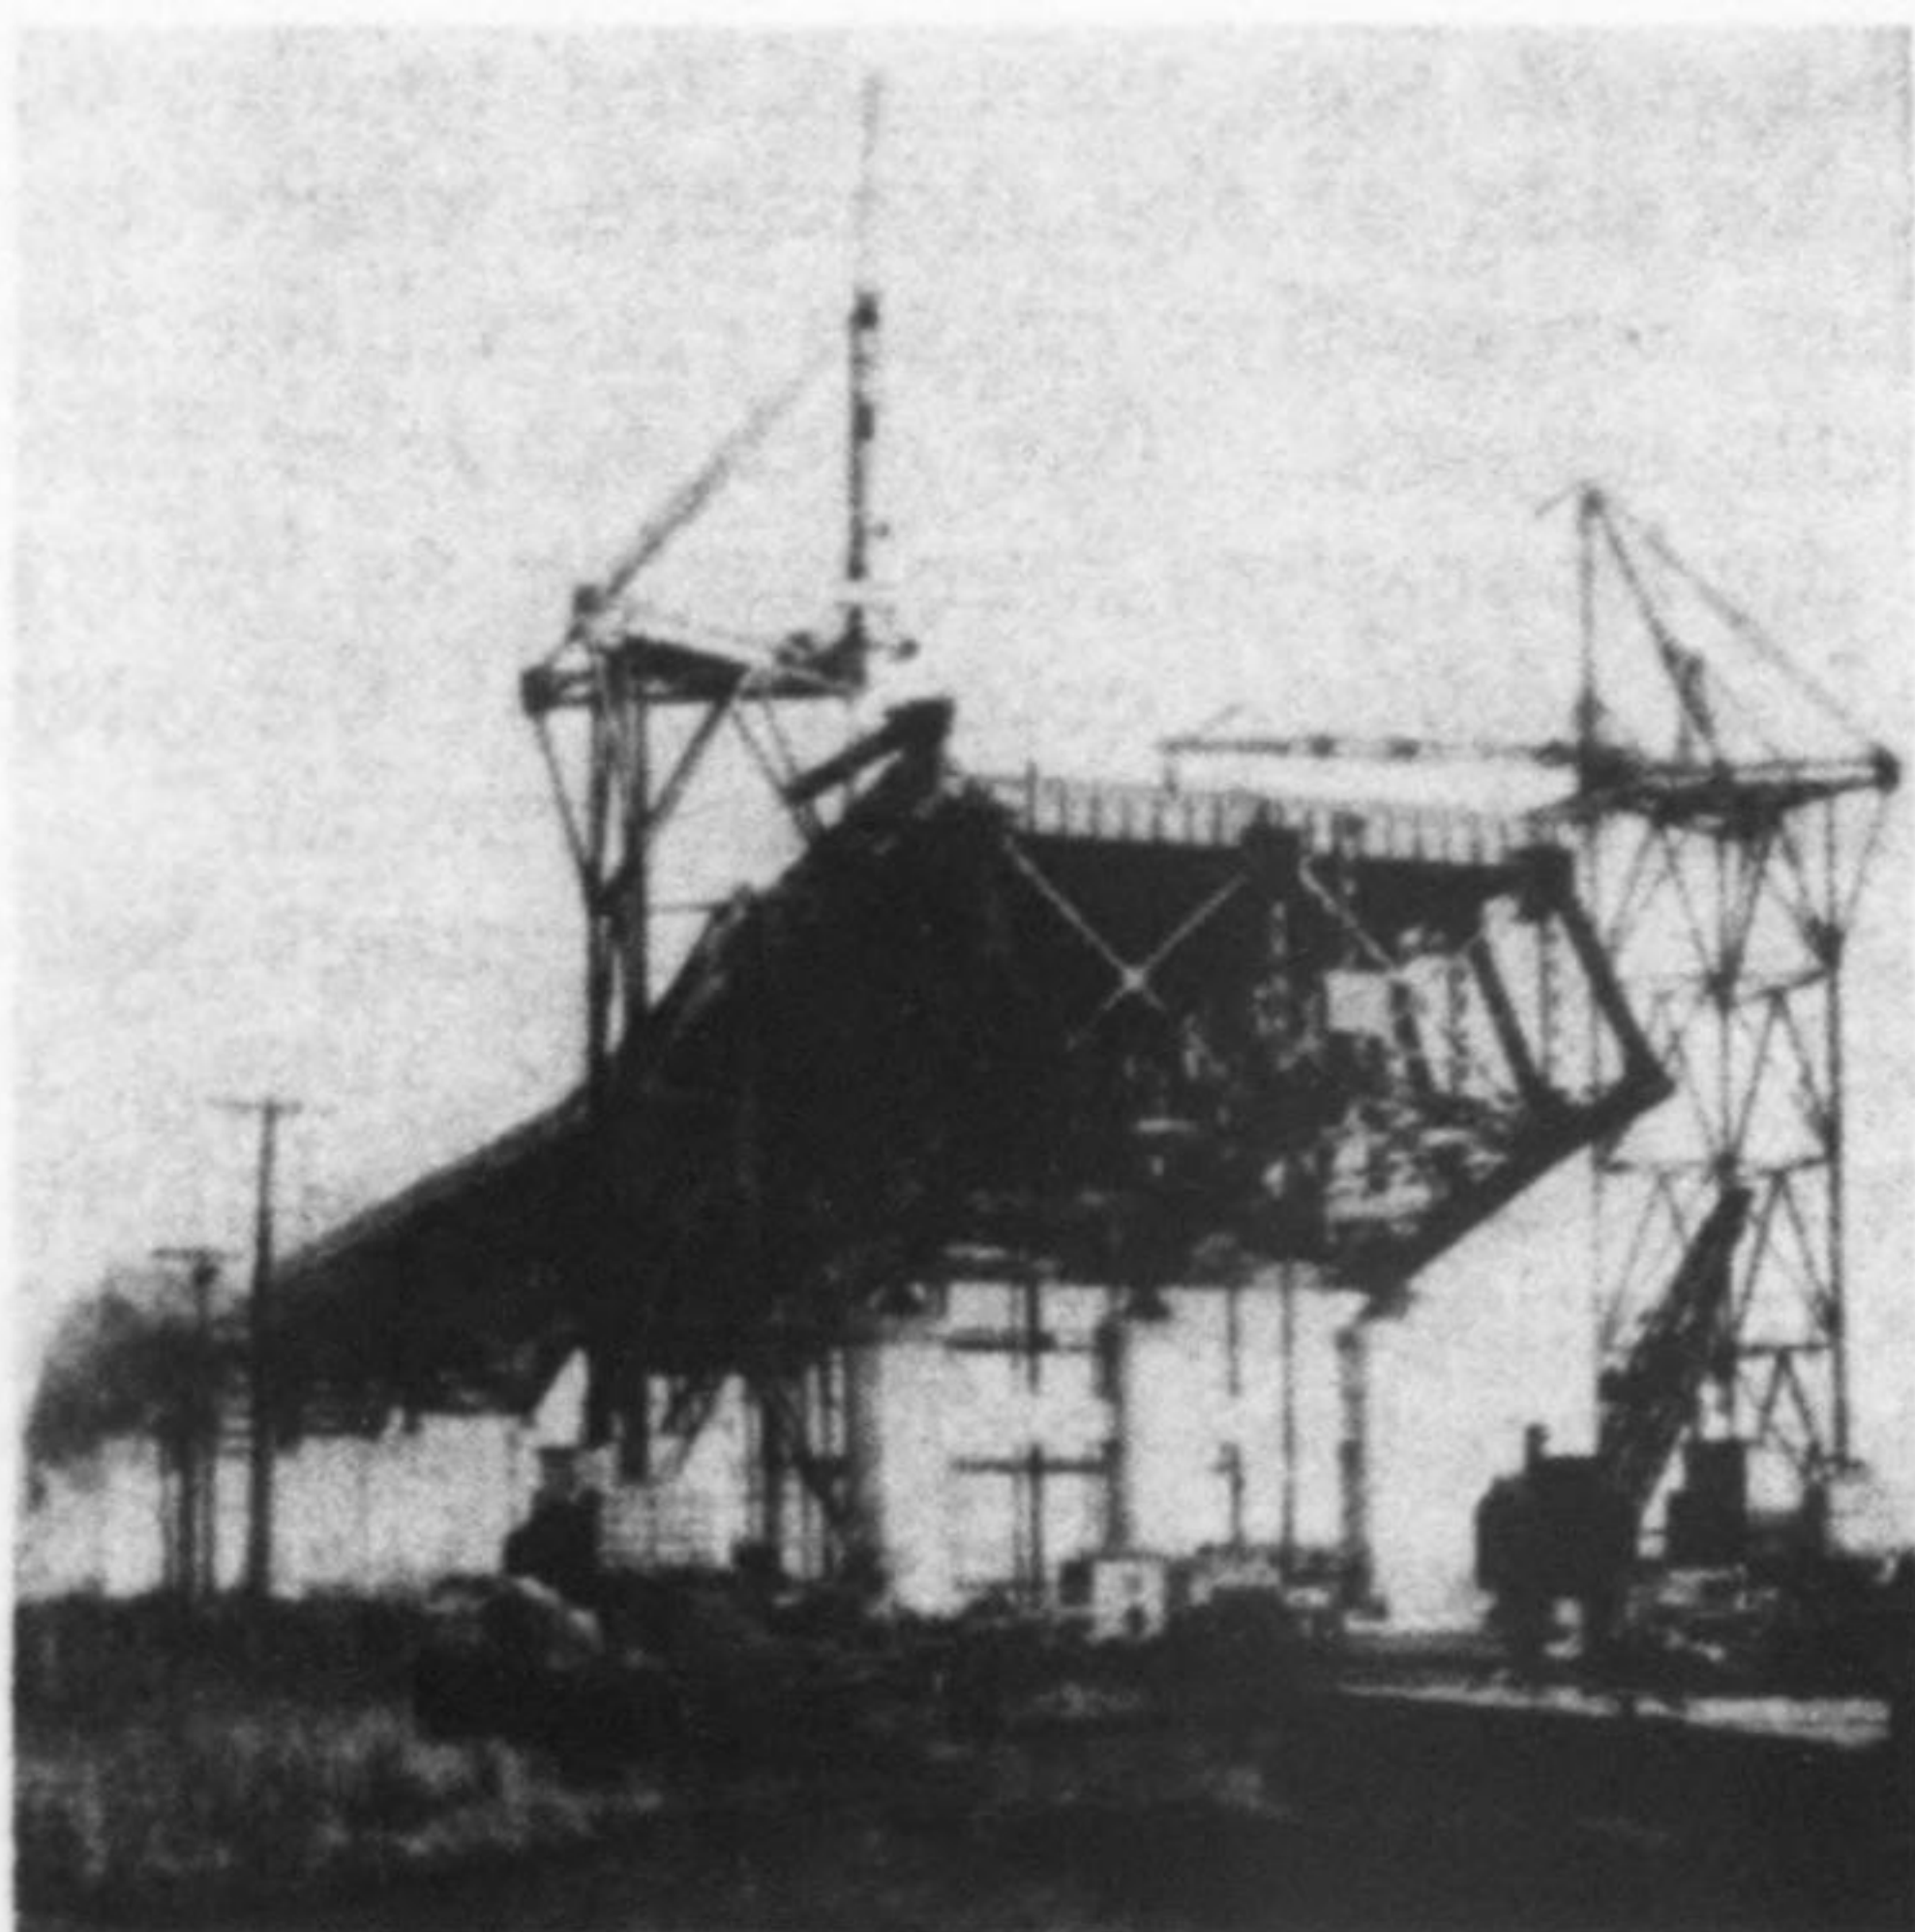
Widening the viaduct to accommodate ramps required three trusses and in some places four instead of the two used elsewhere. View is on Phoenix Bridge section just west of Hackensack River bridge.
